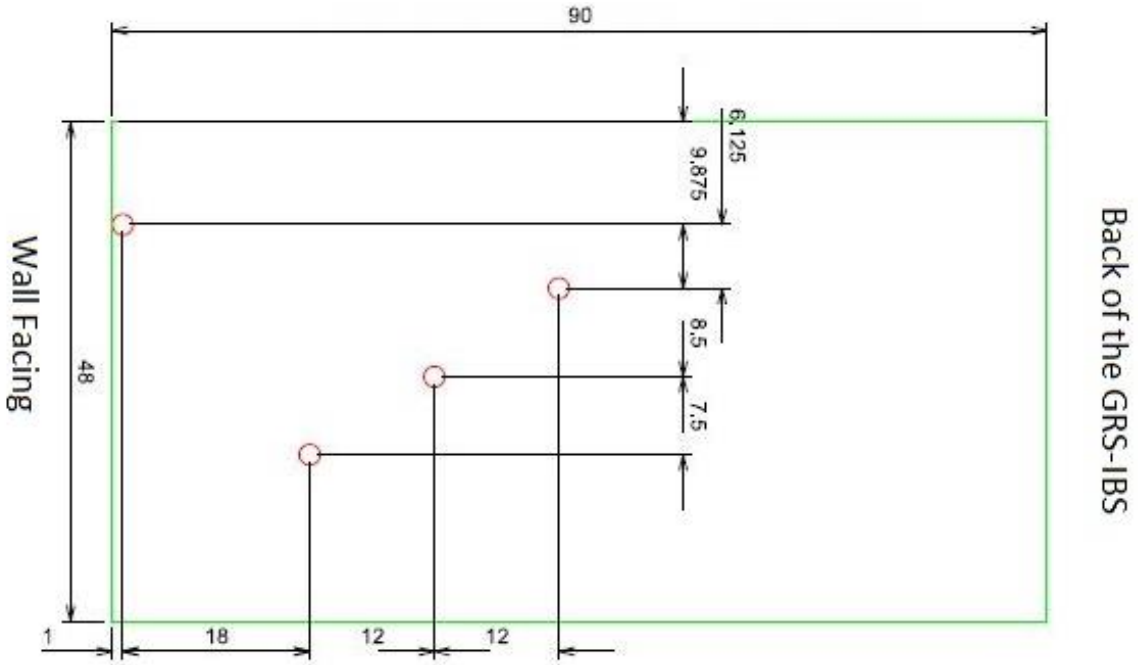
Plan view of WP connections to geotextile reinforcement at H = 51-inch above the foundation slab of GRS Abutment Models #1-#3 (dimensions are in inches)
